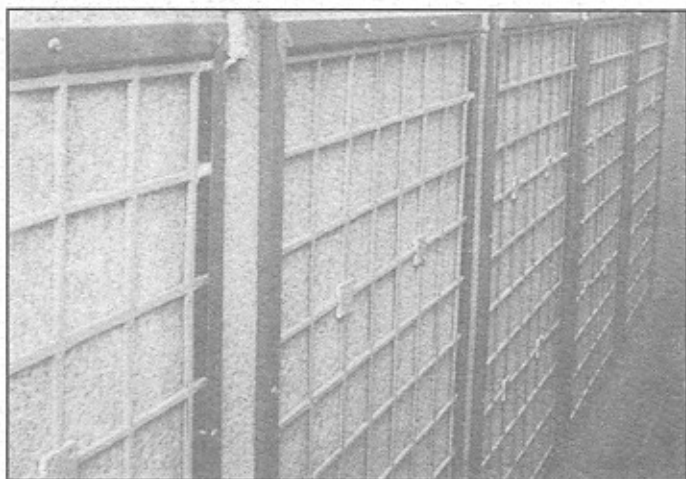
Use of "Bright Guard" Reinforcement for Concrete Walls
